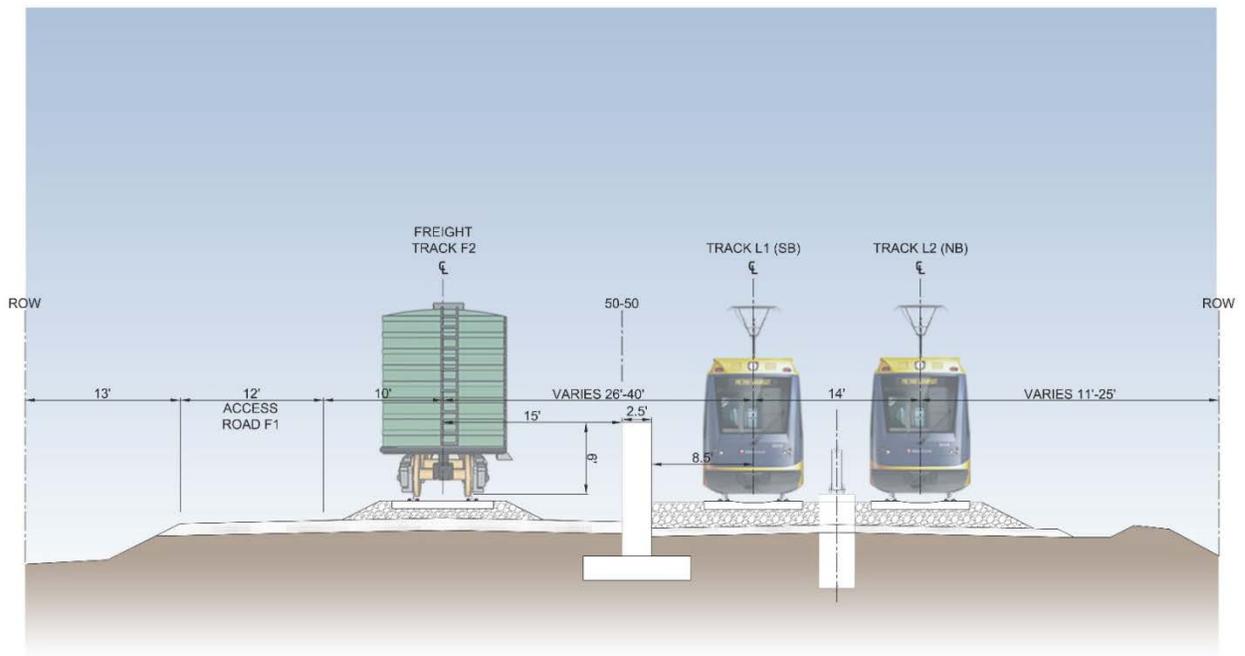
Typical Railway Section – Wall Corridor Protection
